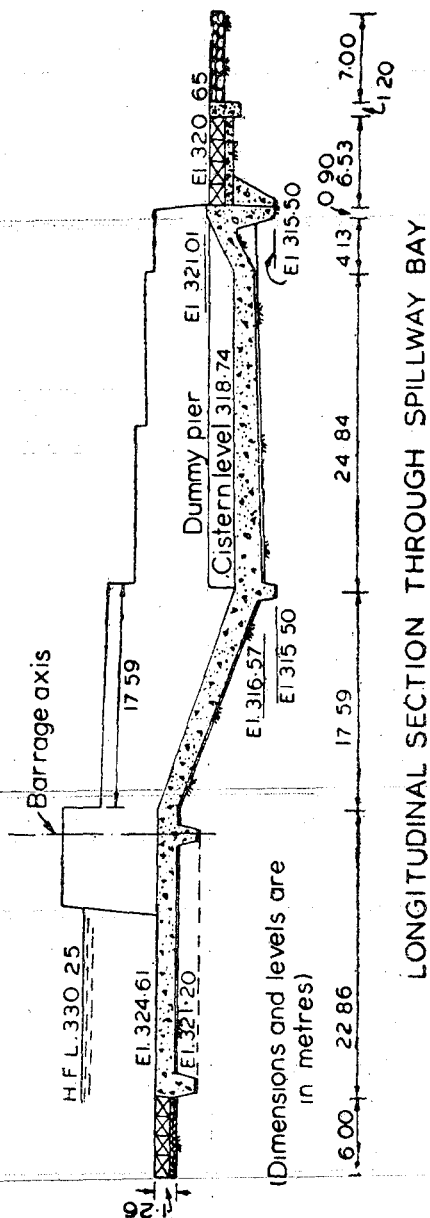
(d) Section through Spillway bays of Shah Nehar Barrage.
